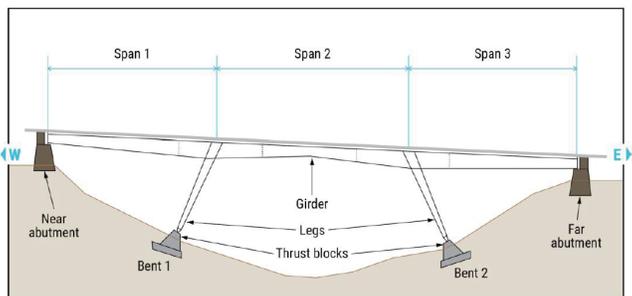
Simplified side (elevation) view of K-frame structure of Fern Hollow Bridge (looking north). Bents 1 and 2 were composed of two legs each; only the southwest and southeast legs are visible in this diagram.
